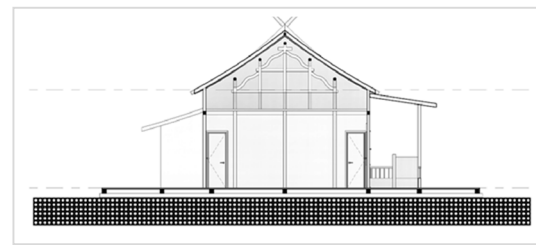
Elevation of Palembang Raft house (*Rumah Rakit*)
